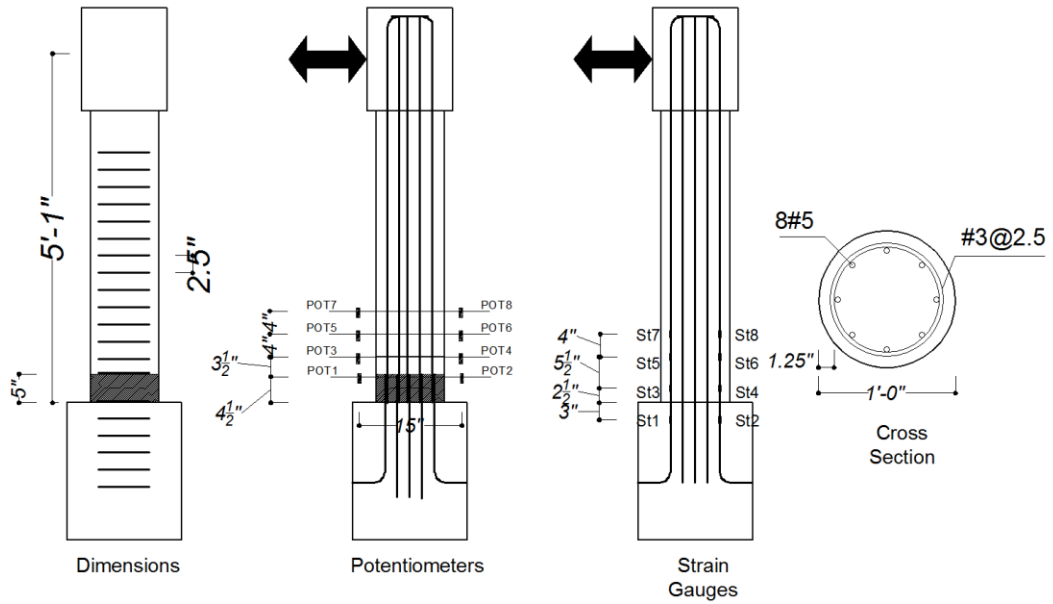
Specimen S-5-8 details, dimensions, reinforcement and installed measurement tools. (No stirrups at splice region).
